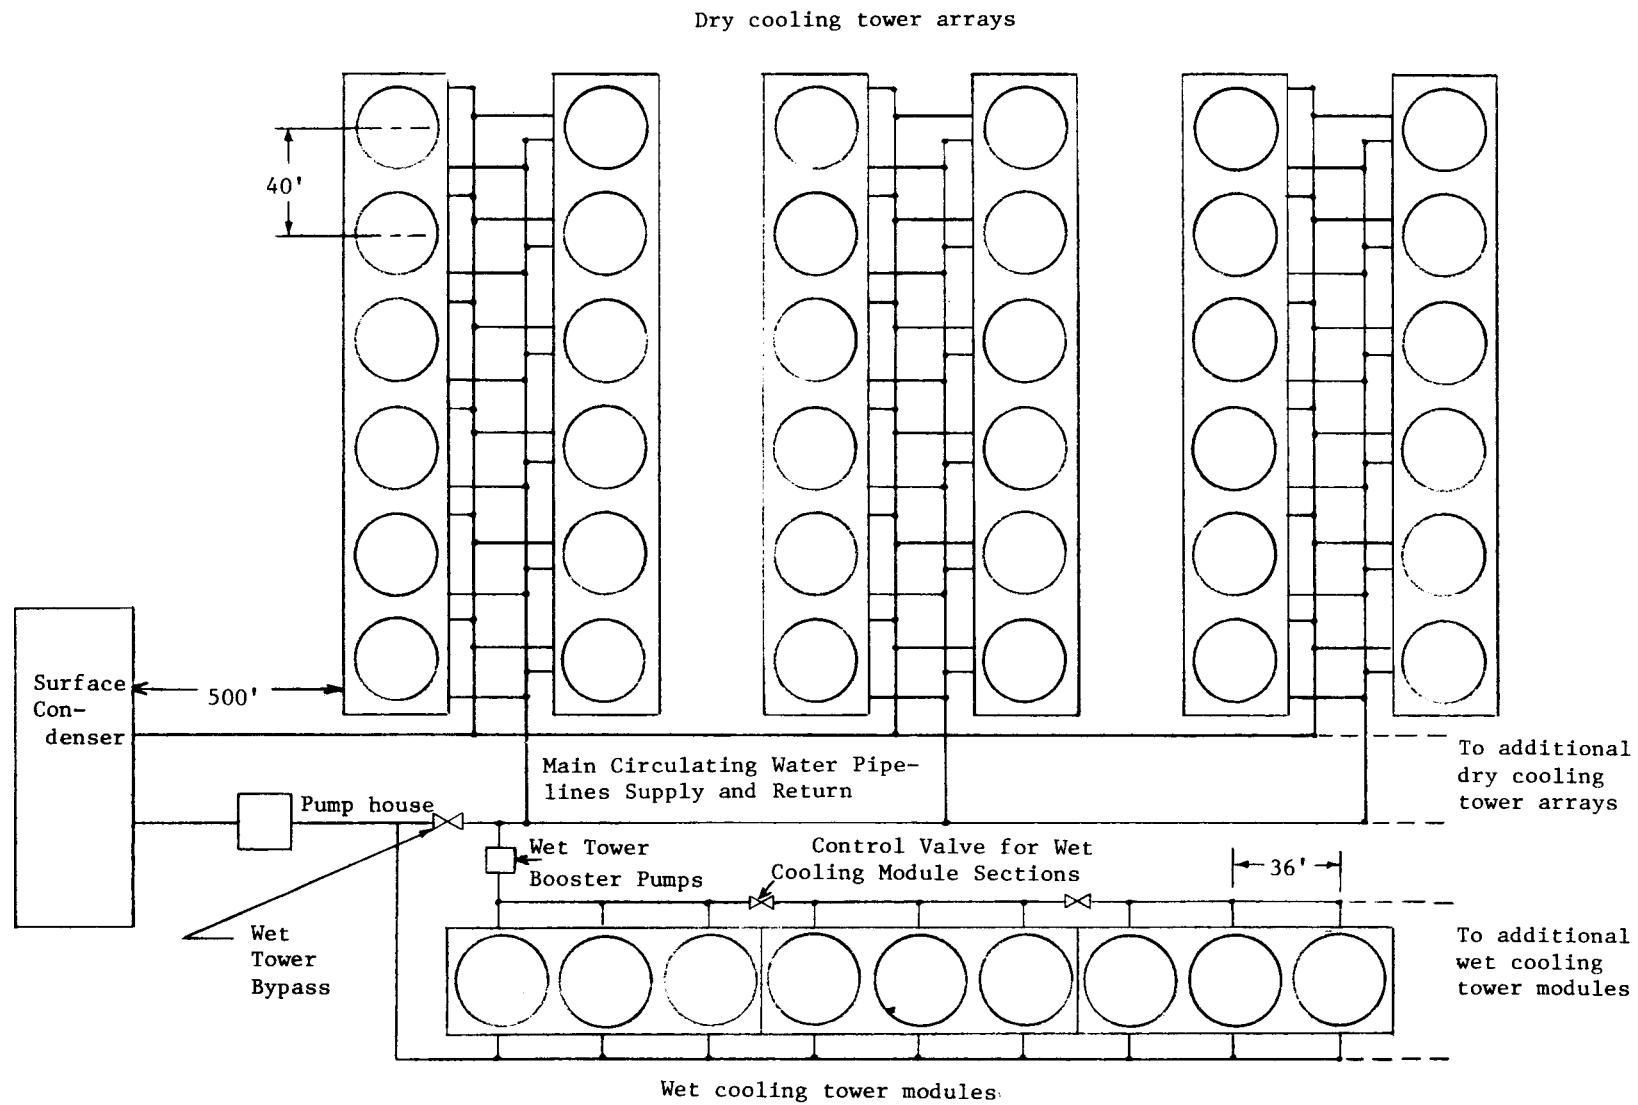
Series Flow Separate Wet and Dry Tower Heat Rejection System and Piping Layout
